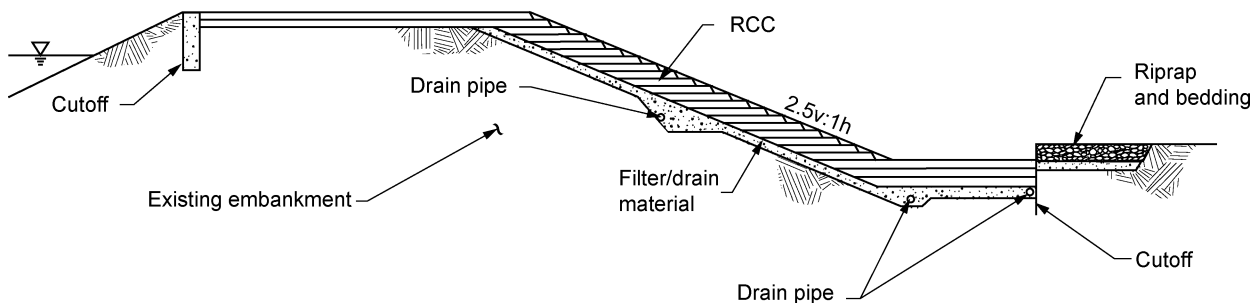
Typical section, RCC overtopping protection (PCA, 2002)
